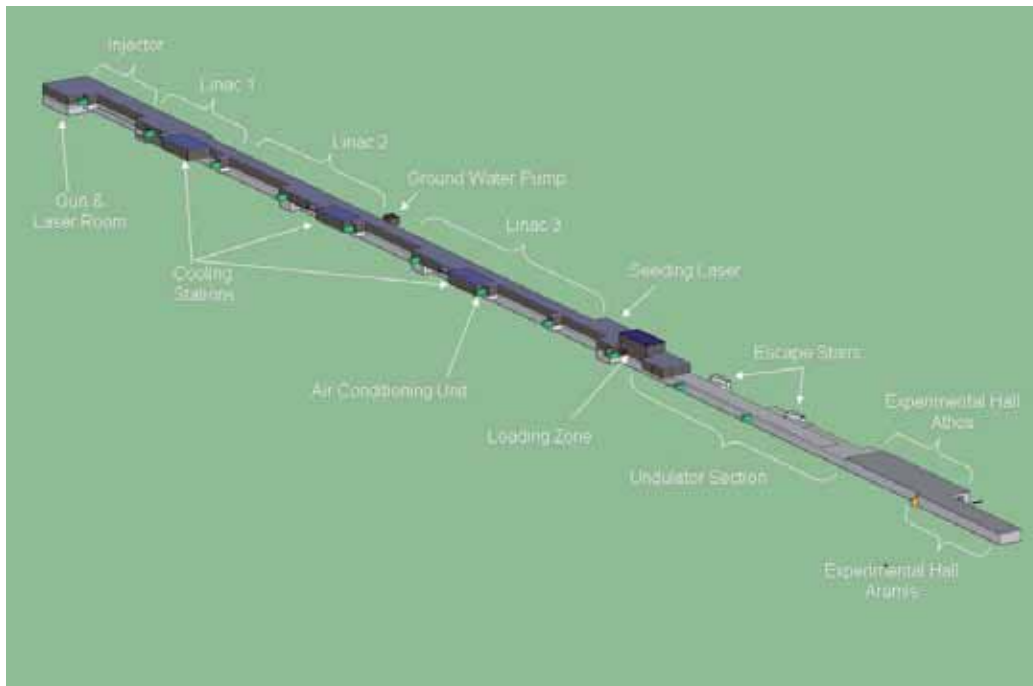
Overview of the SwissFEL facility showing the different infrastructure buildings.
